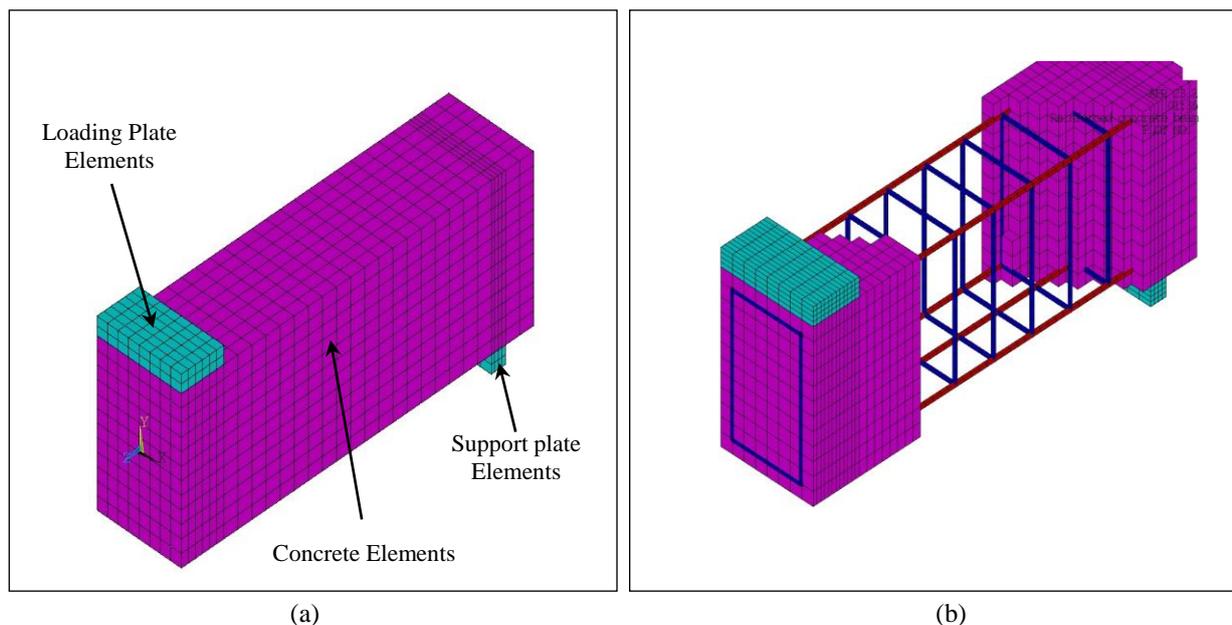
(a) Meshing of the concrete beam, steel plate, steel support, (b) Reinforcement details.
